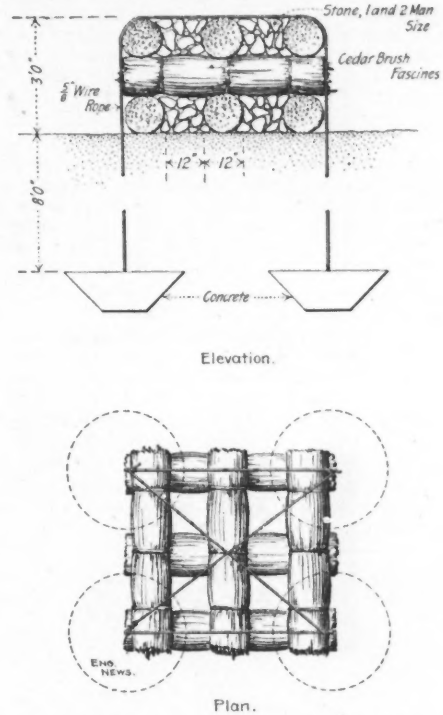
Sketch Plan and Section Showing Construction and Anchorage of Jetty Breakwater at Atlantic City, N. J.
